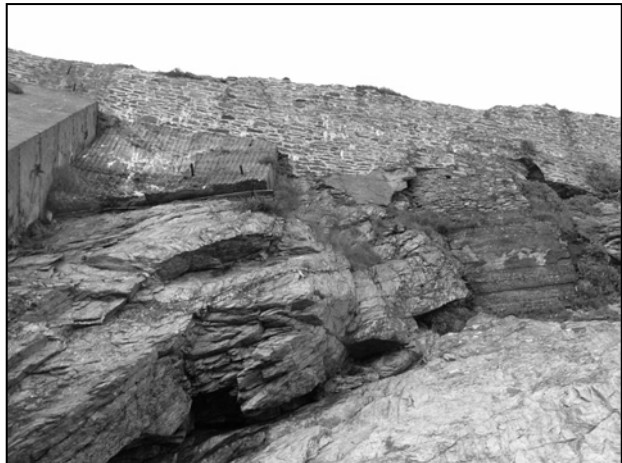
High-level wall retaining access road which displayed cracking and was considered to be in danger of collapse
